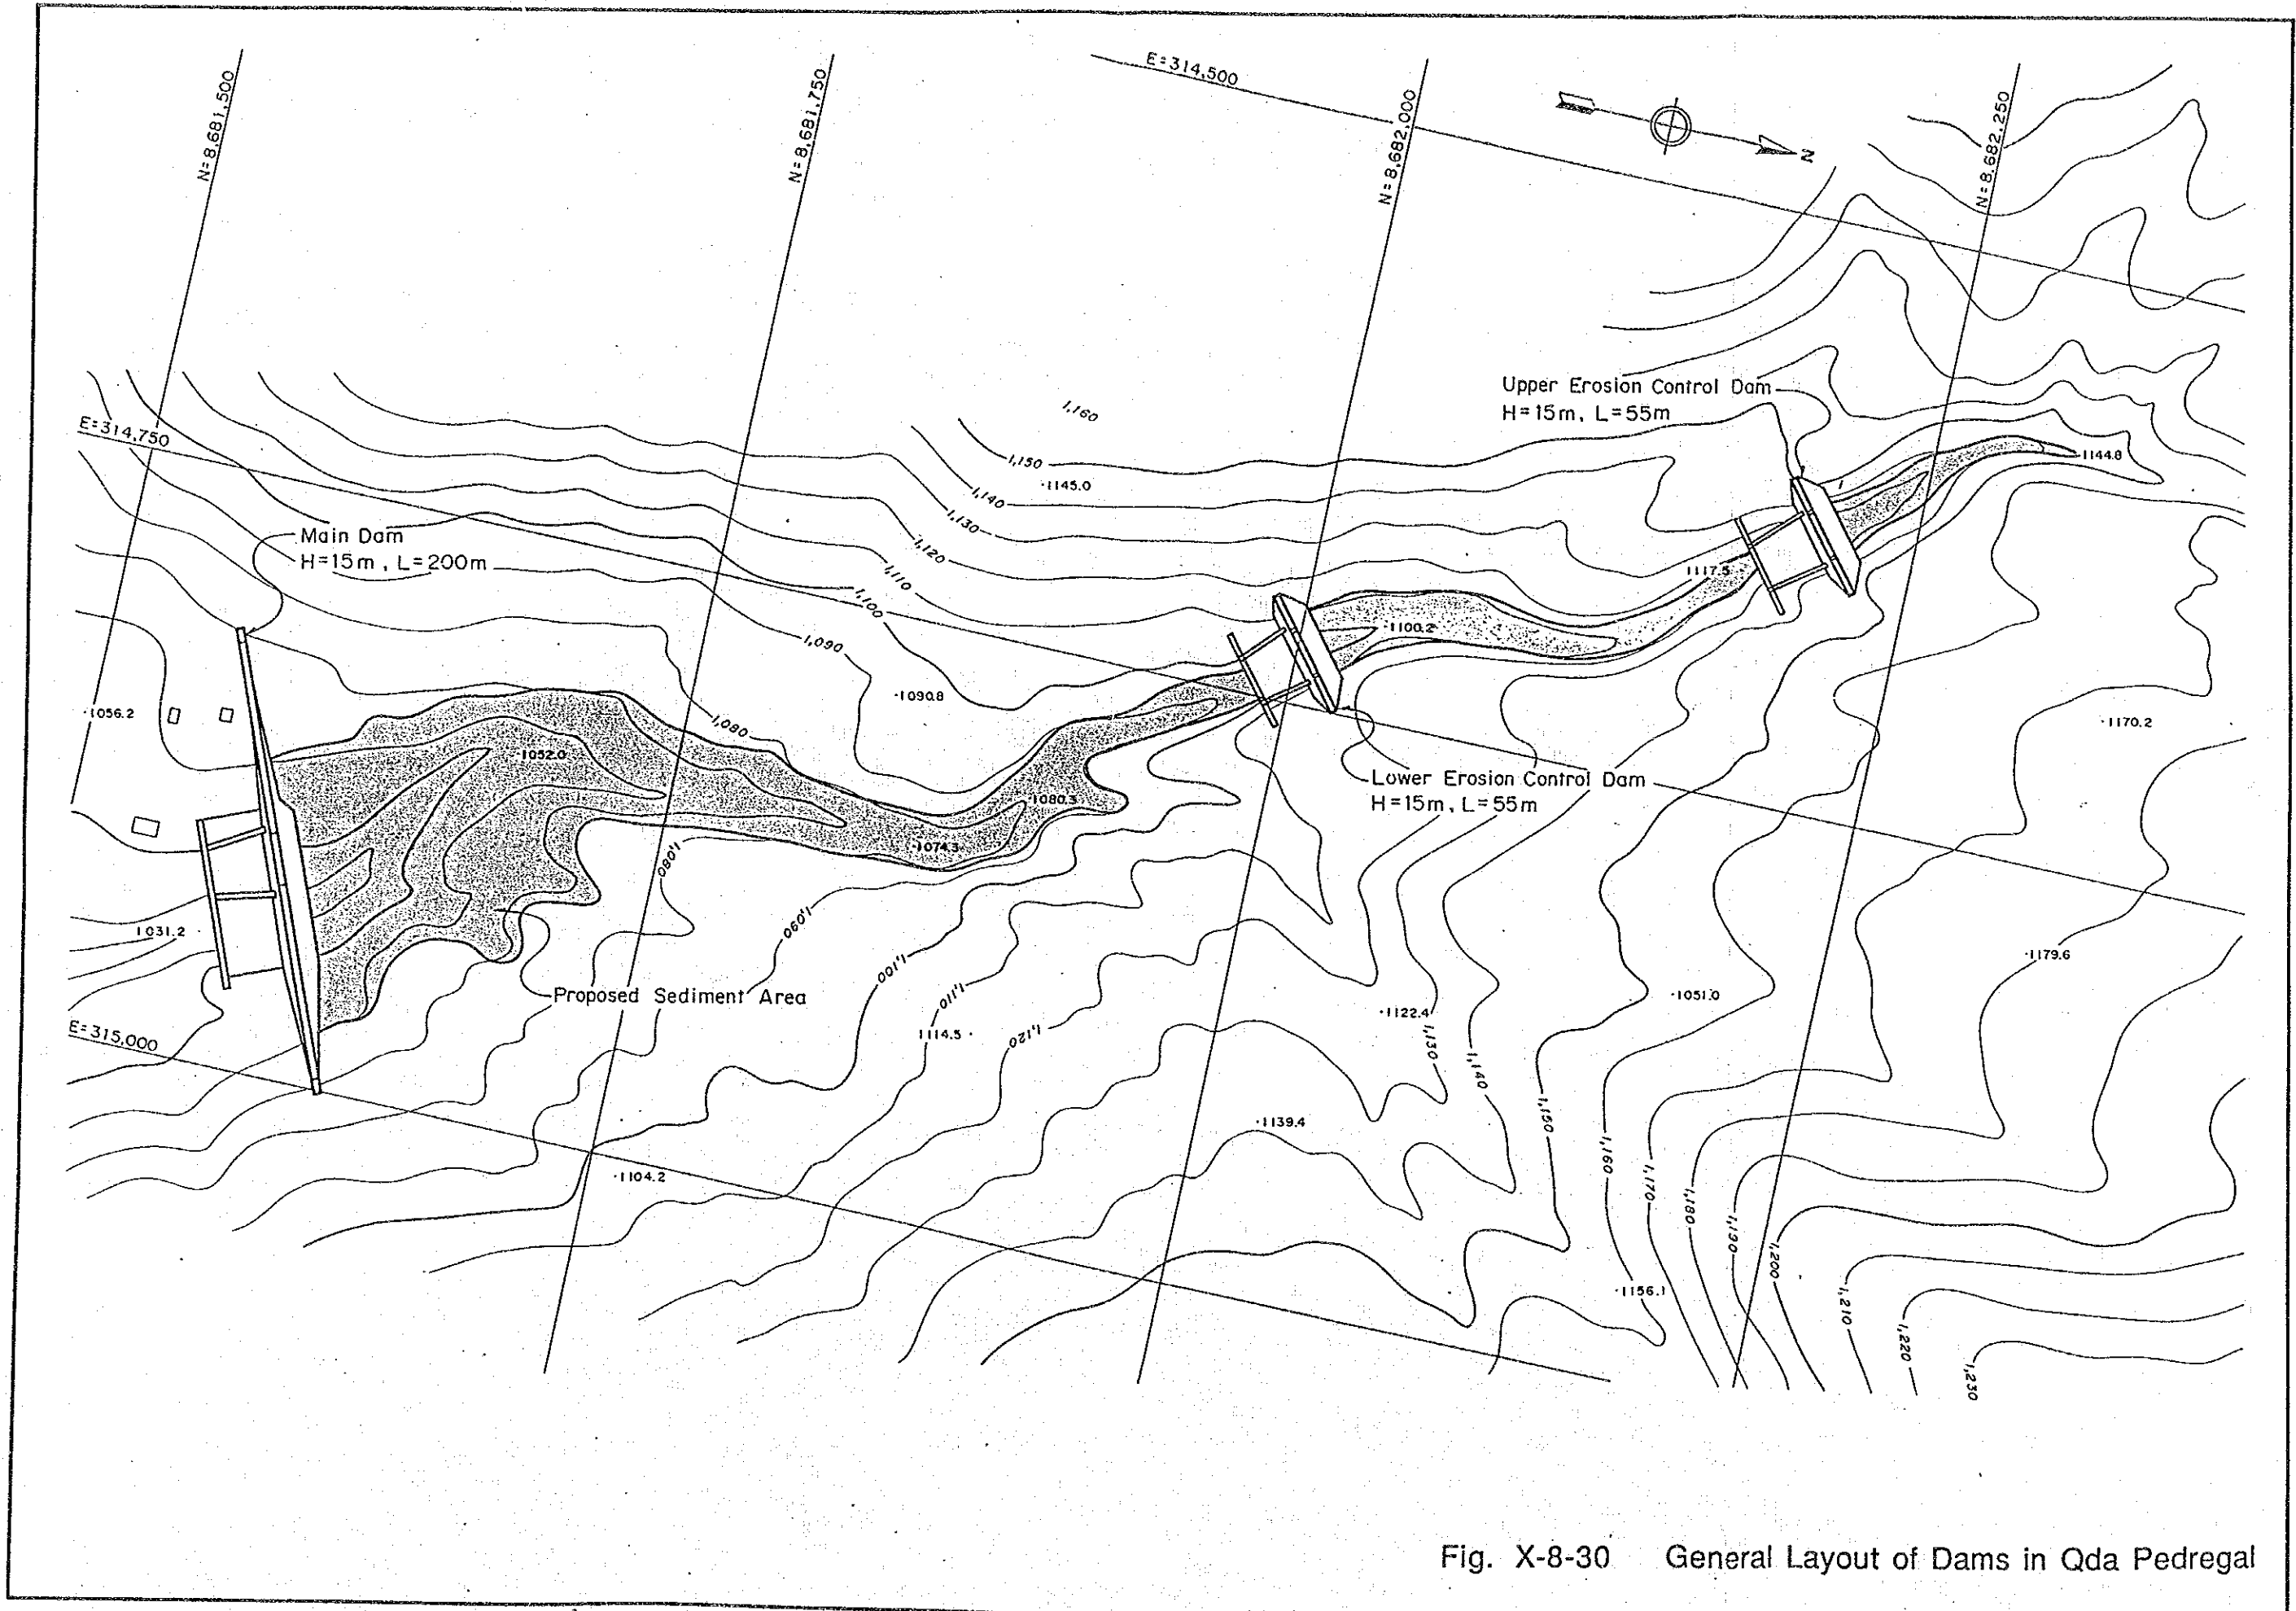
General Layout of Dams in Qda Pedregal
